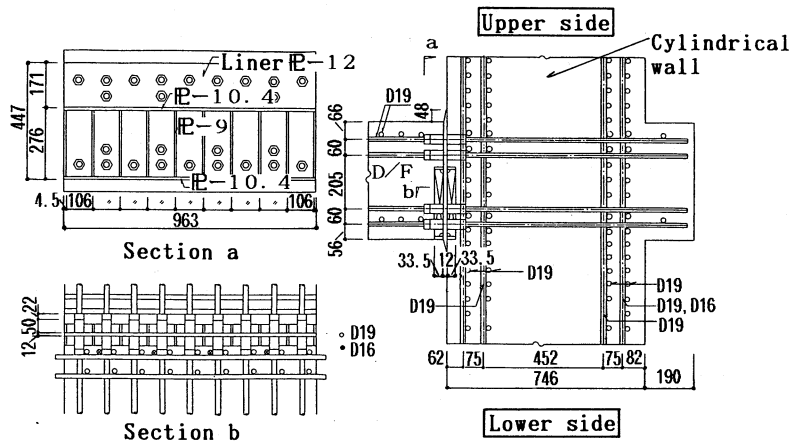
Joint detail of the specimen (No. A-1, A-2)
